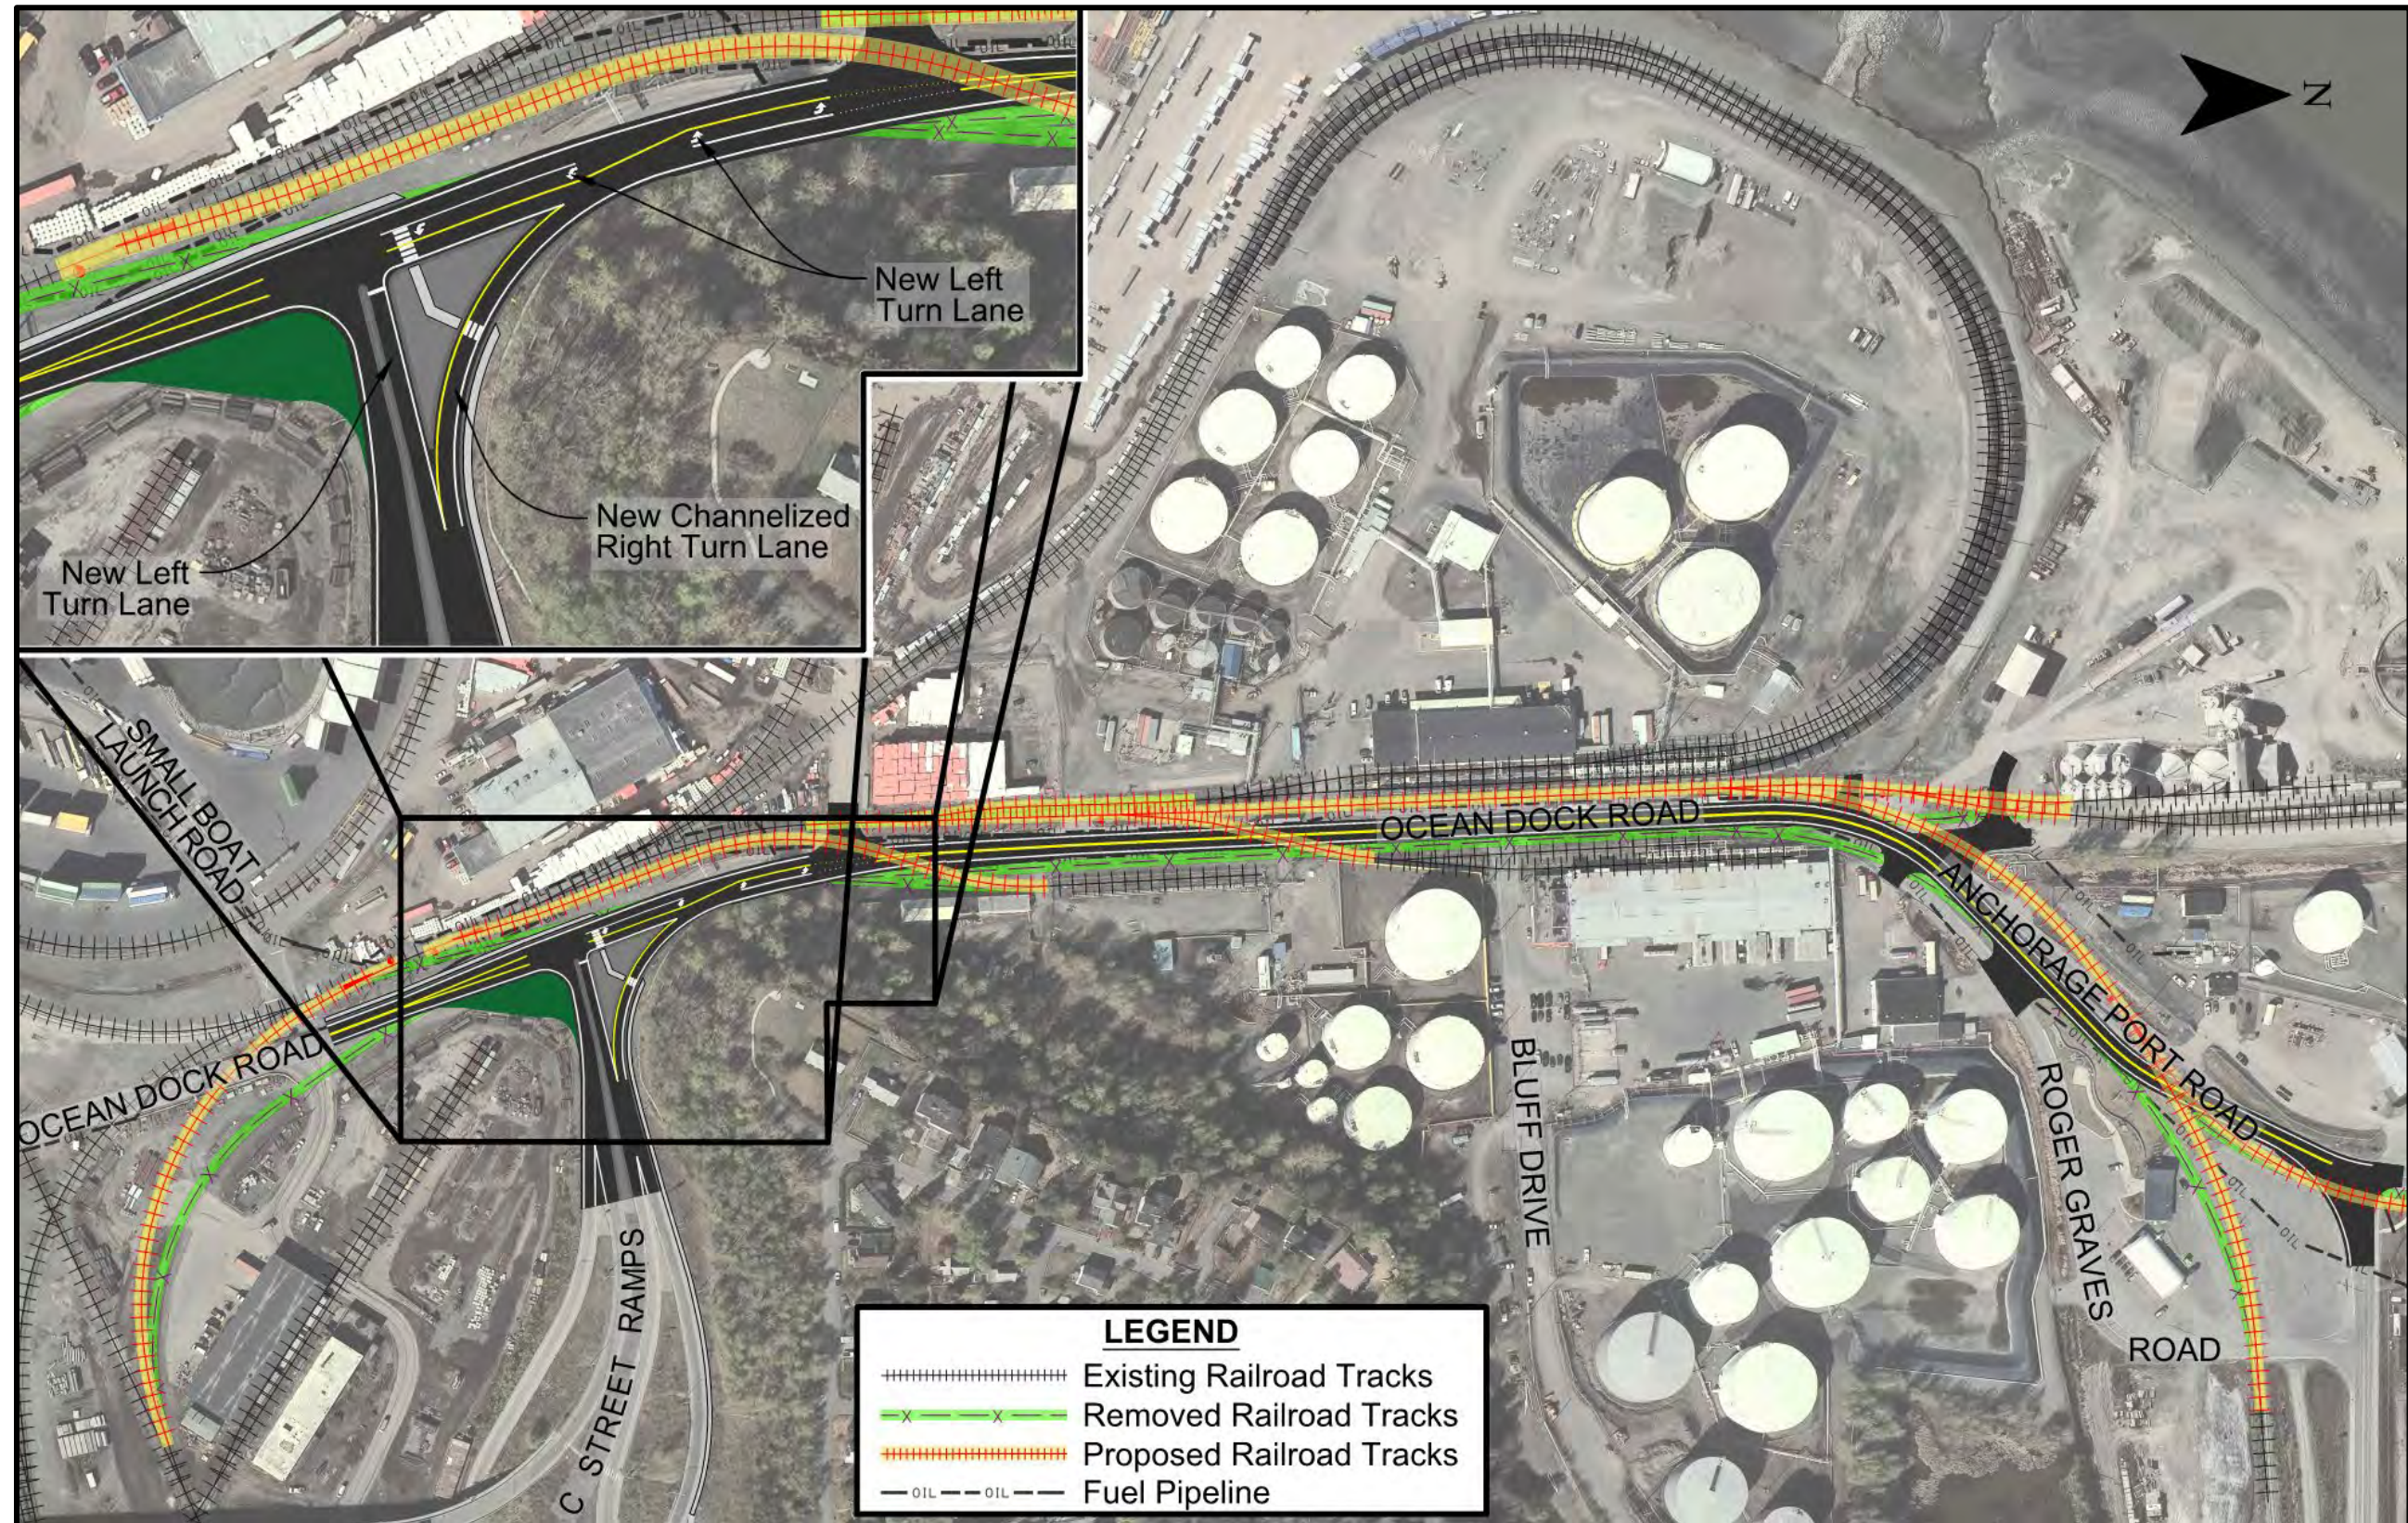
Road Concept B (Realigned T Intersection) and Left Turn Lane at North Star Access with Rail Concept 1
